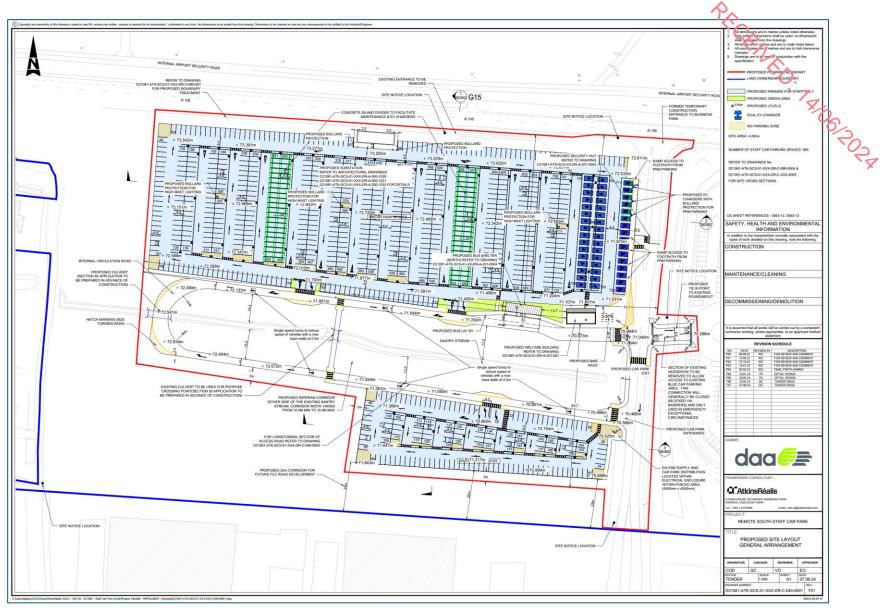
Proposed Site Layout Plan for Remote South Staff Car Park
